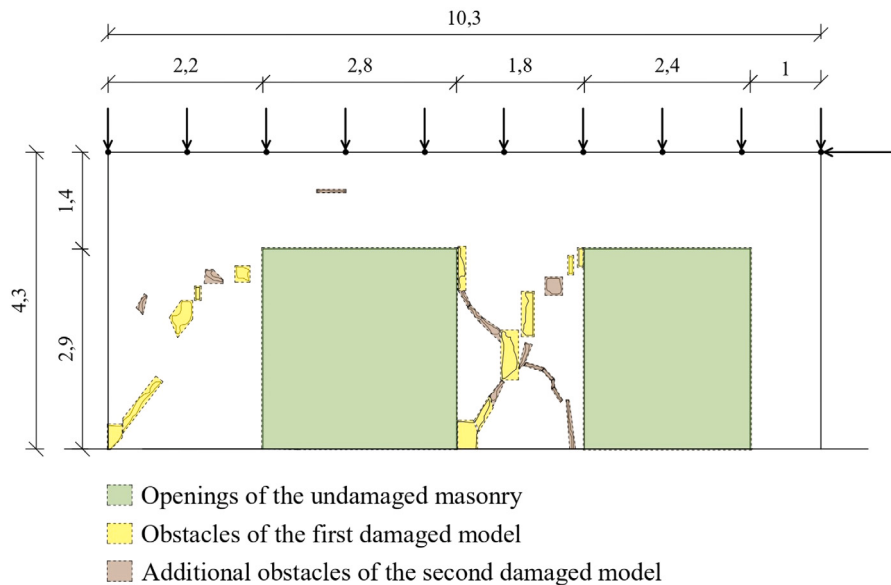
Geometry and loading scheme of a damaged masonry wall (dimensions in meters).
